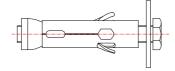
Screw anchor for the fixing of the bracket support to a reinforced concrete wall
